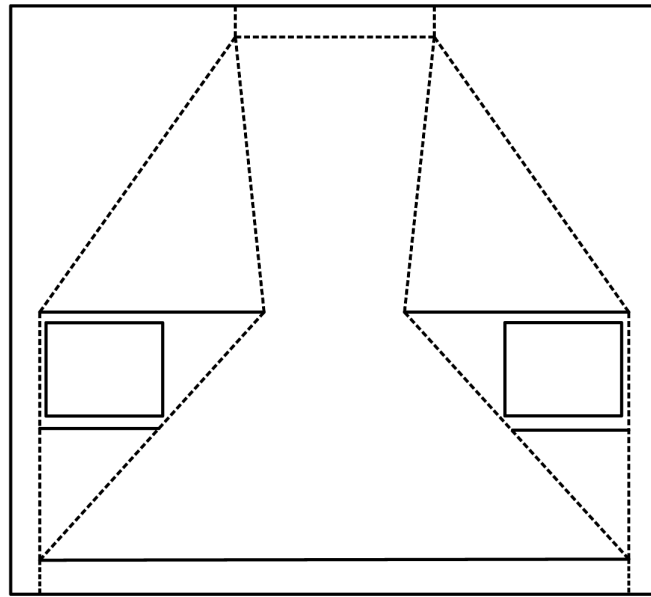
Strut and Tie model for Case 4.1 without prestressed reinforcement
